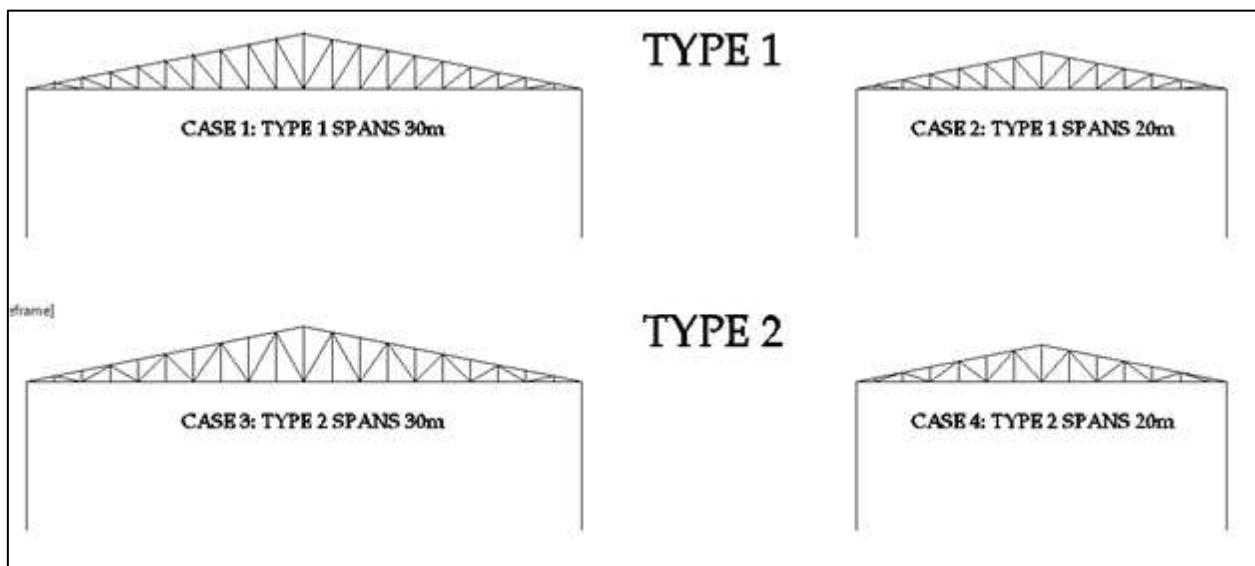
Different cases considered for the design purpose Type 1 Pratt Truss and Type 2 Warren Truss
